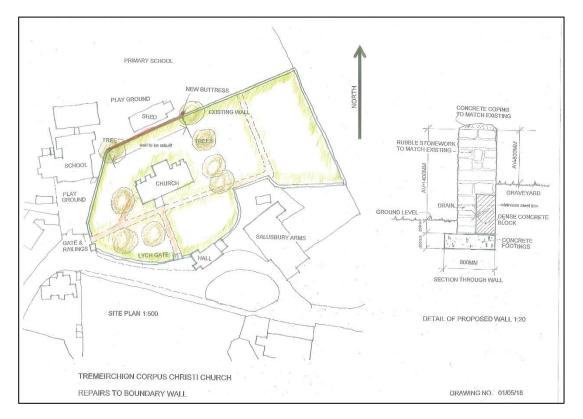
Location plan showing the section of churchyard wall that was rebuilt to the north of the church (courtesy Robin Wolley Architect)
